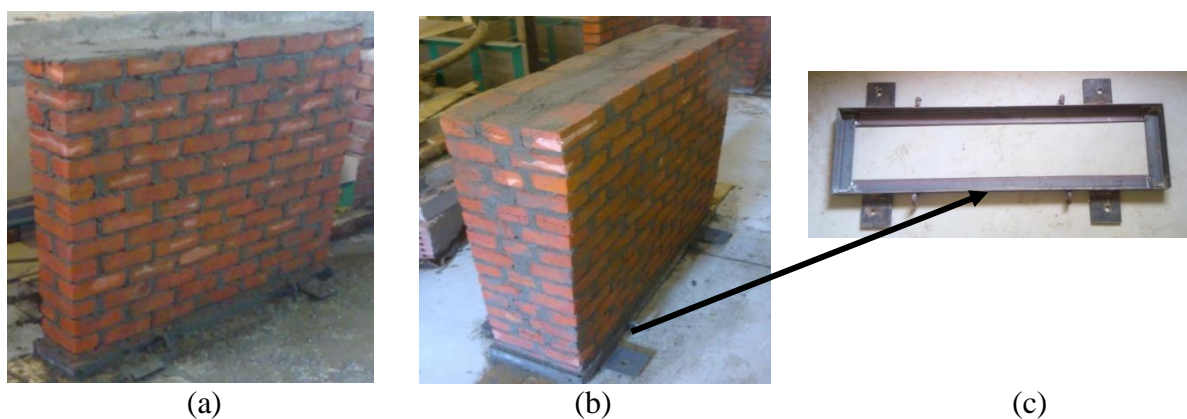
Physical model for Masonry Piers in Original Condition a) P170, b) P260, and c) Supporting Steel Base
